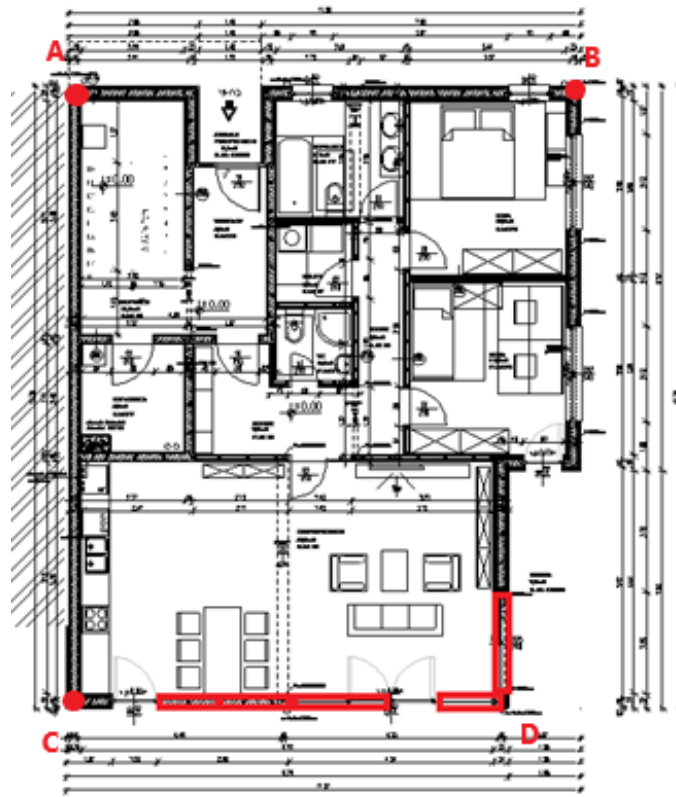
Floor plan of the building and the marked DSF elements (in red).
